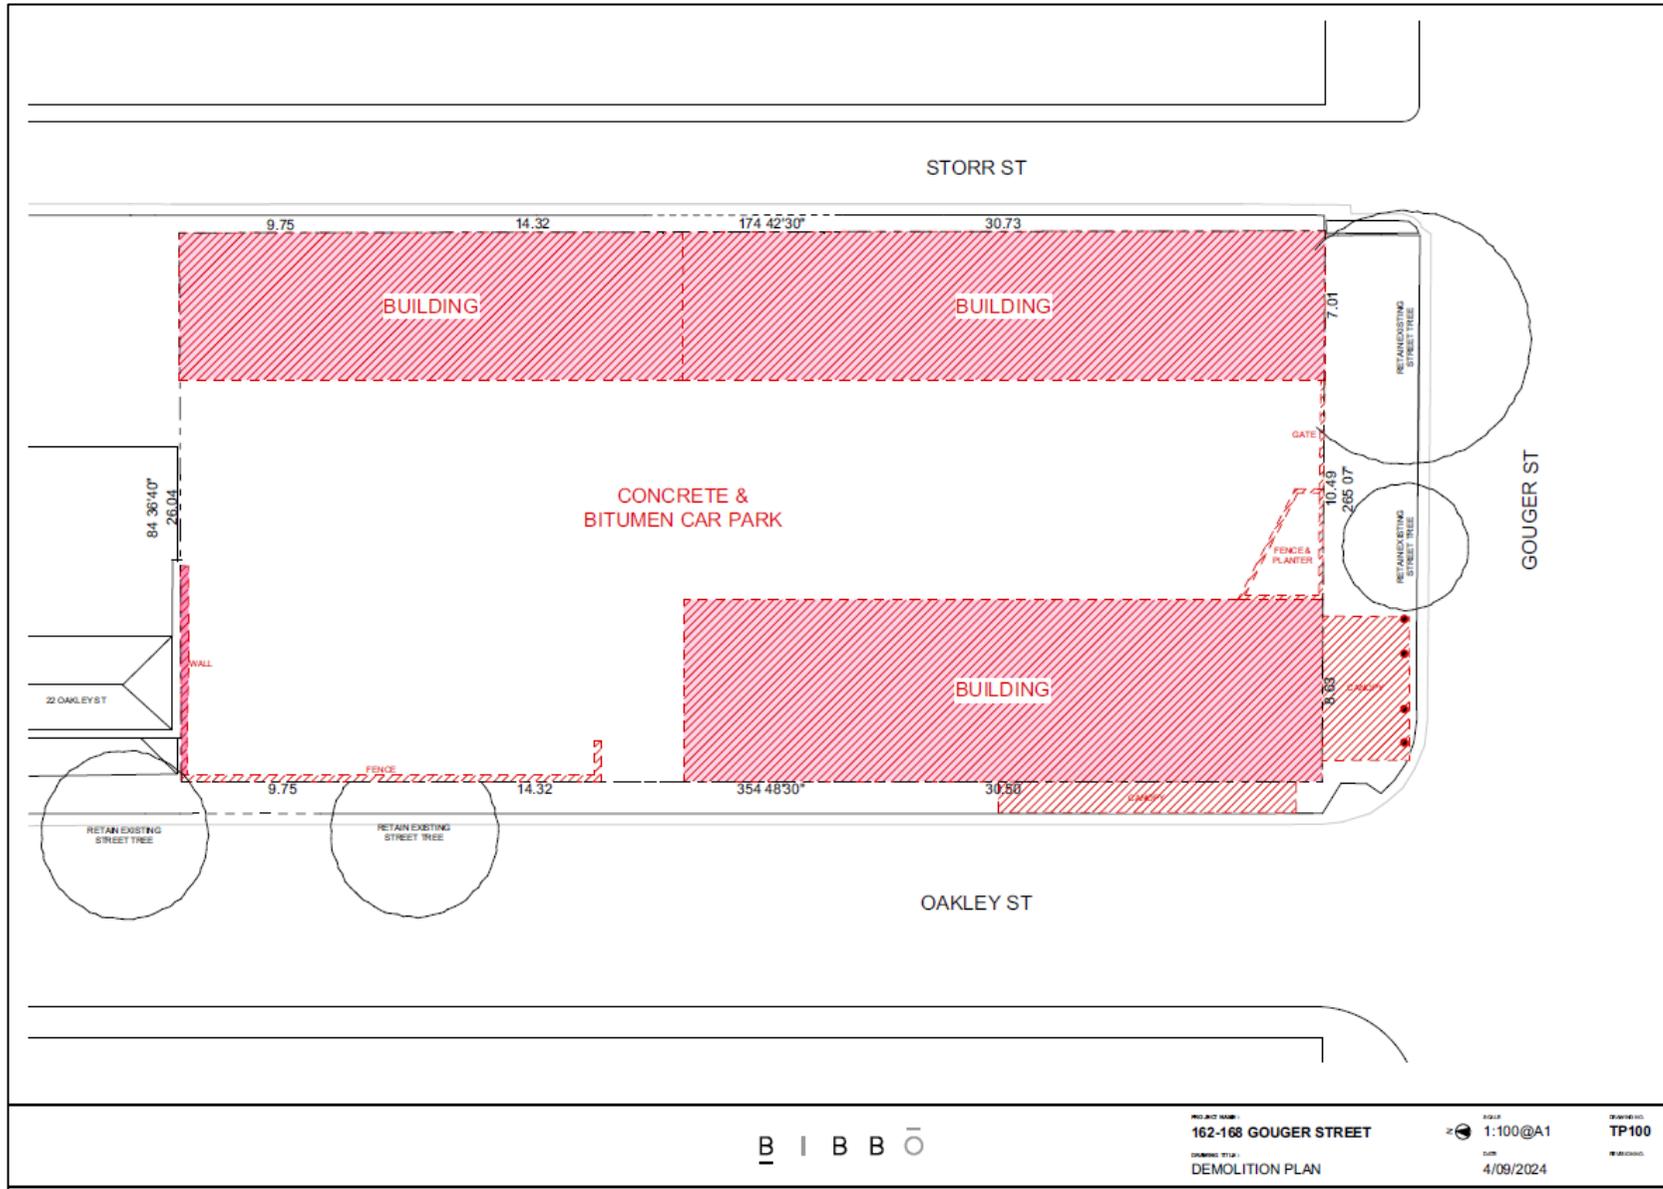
Site Plan Layout (Bibbo Architect 2024)
